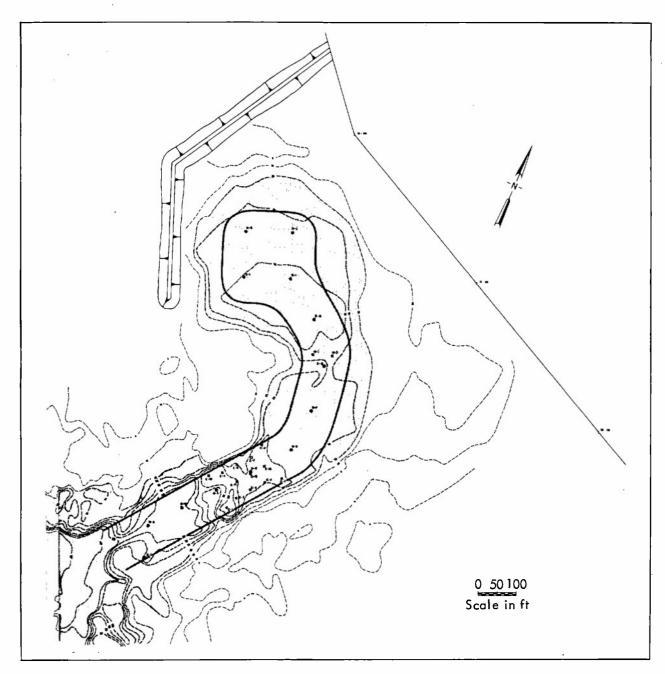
Planned area of excavation and final 12-ft depth contours after remedial detonations, Project Tugboat.
